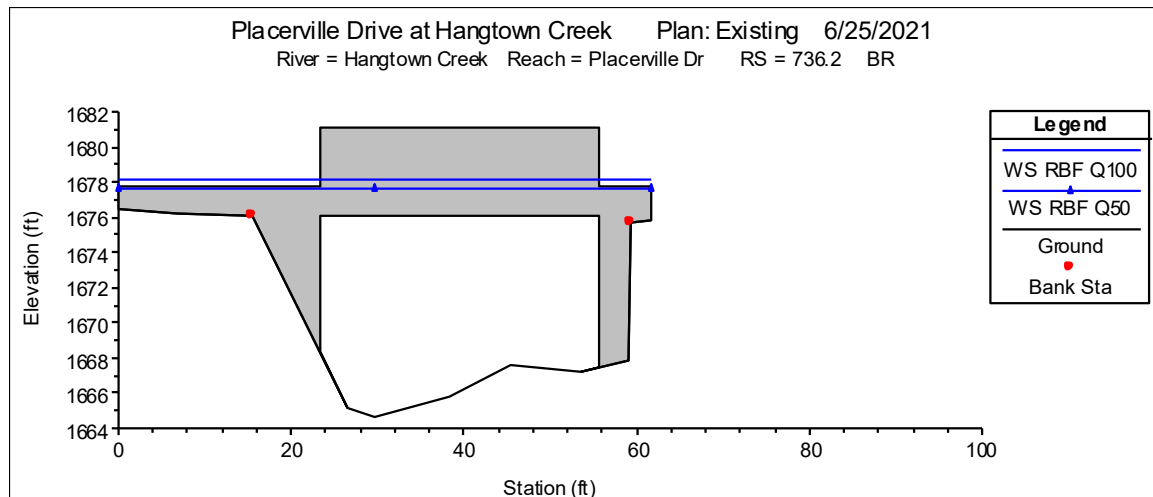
Existing Bridge Cross Section (Facing Downstream)
